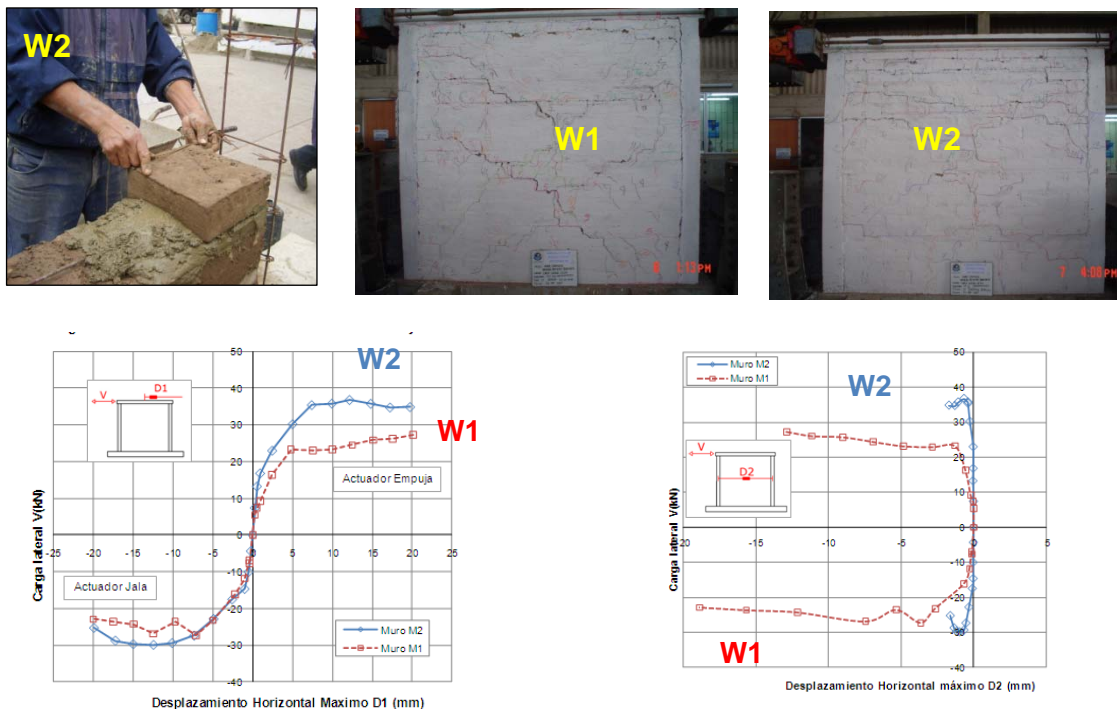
Cyclic lateral load in Walls W1 (unreinforced) and W2 (with horizontal reinforcement); hysteretic envelope V-D; and relative displacement between columns
